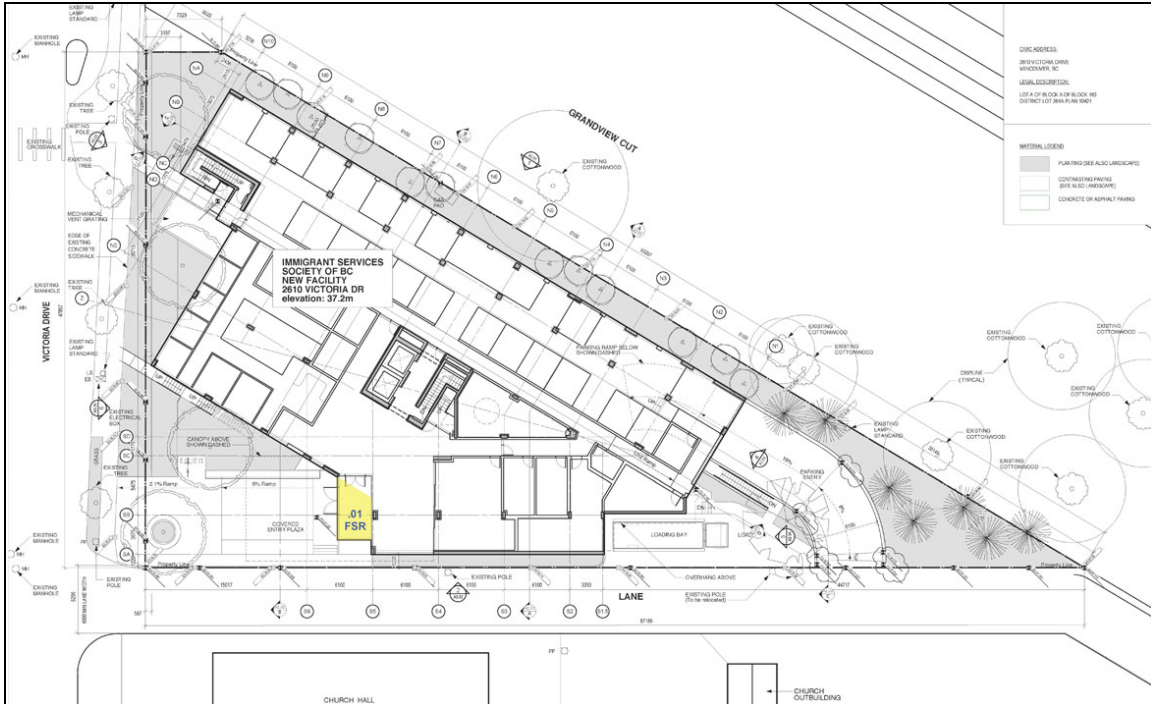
Revised Site Plan Showing Changes to Main Entrance
